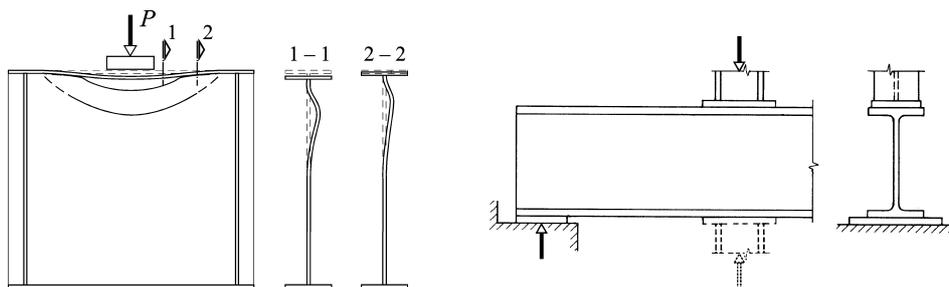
Characteristic collapse form Fig. 2. Purlin or girder loaded by column reactions
